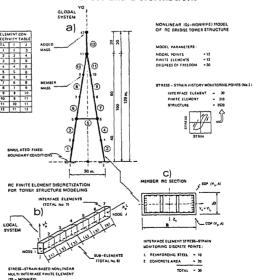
Dicrete Model of RC Bridge Tower Example Structure
